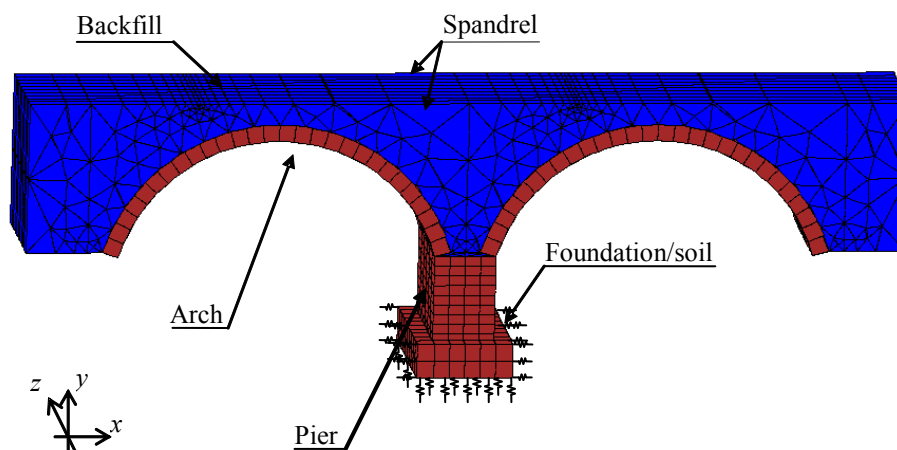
Bridge-foundation-soil model and Winkler-type interfaces.
